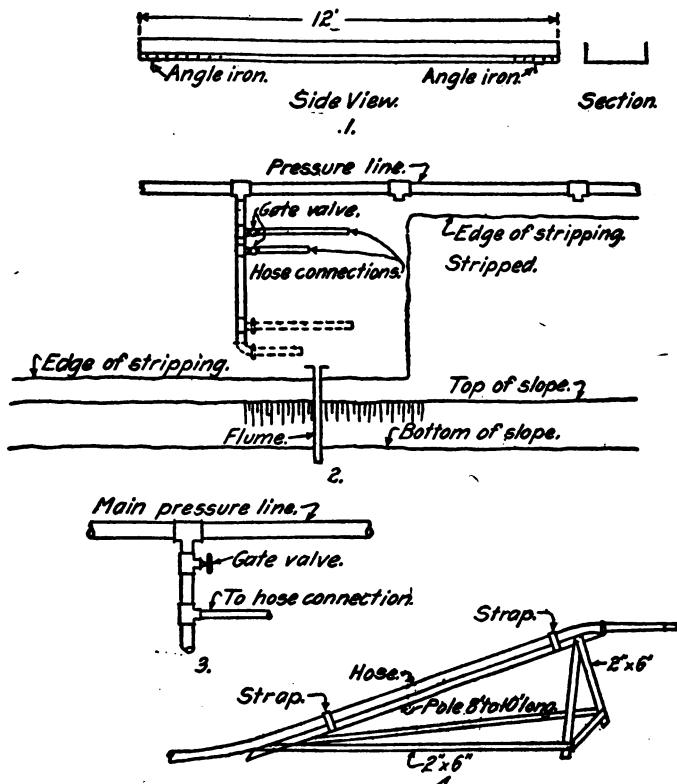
Flume Construction for Stripping Gravel Pits. Sketches 1-4.
